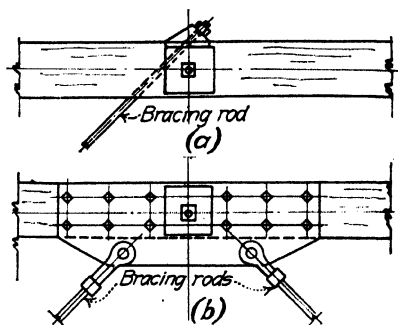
Typical details of connection of bracing rods to upper chord of roof truss.
